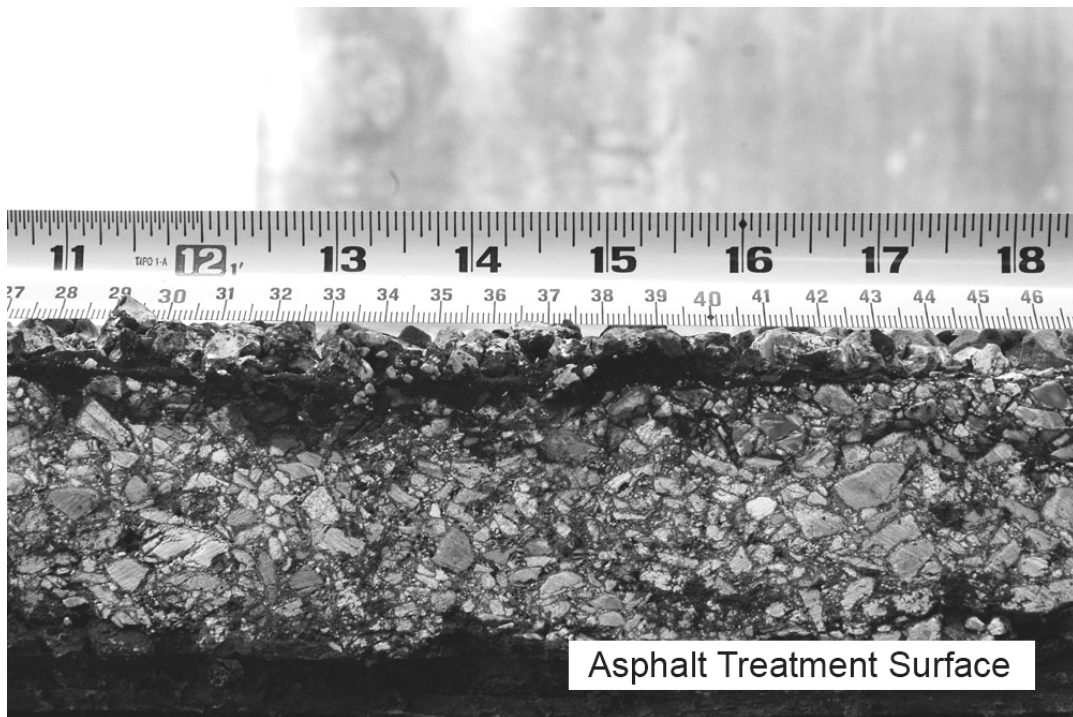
Asphalt treatment roadway surface (longitudinal cross-section)
